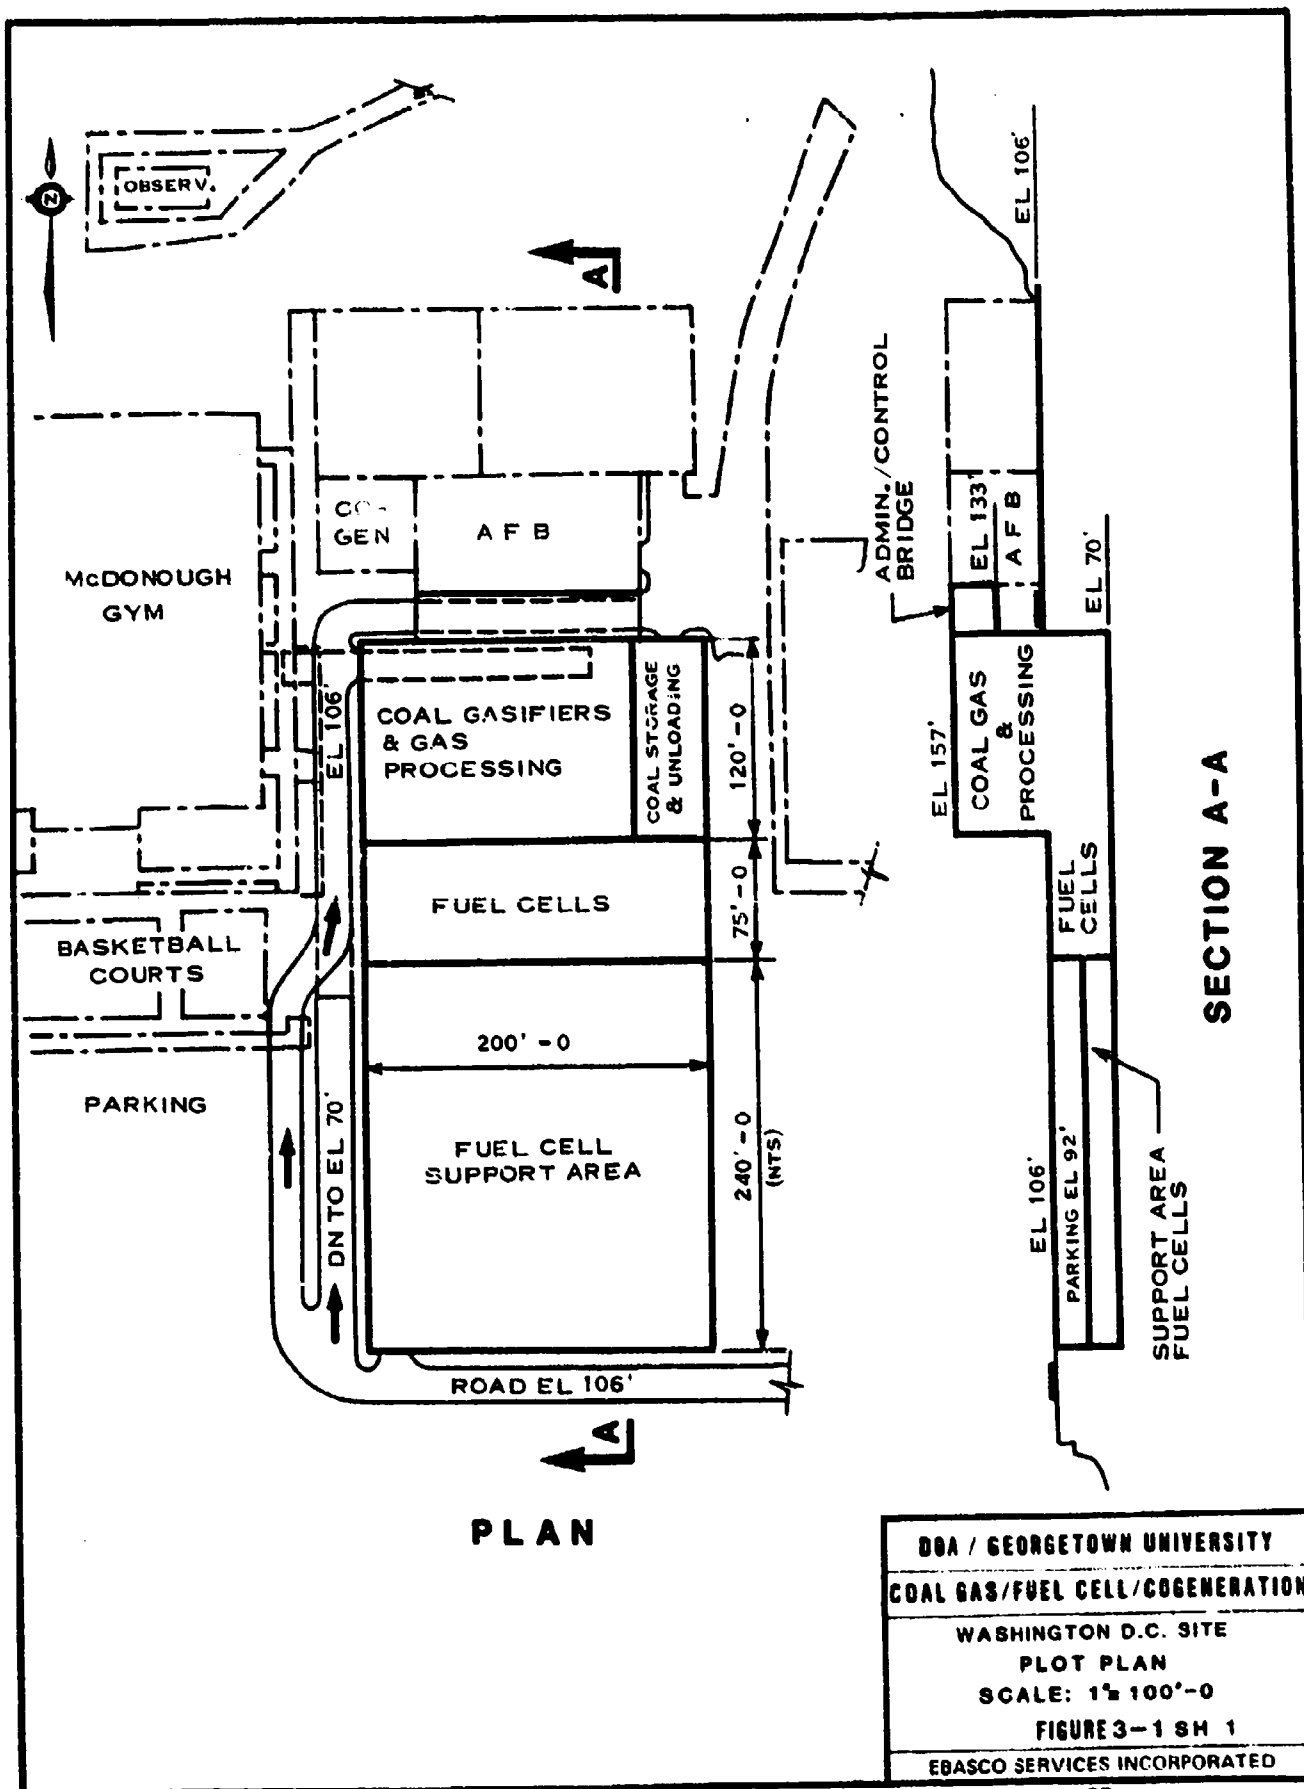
, Sheets 1 and 2 shows the GFC Plant area. Figure 3-2, Sheets 1 and 2 shows the equipment layout.
